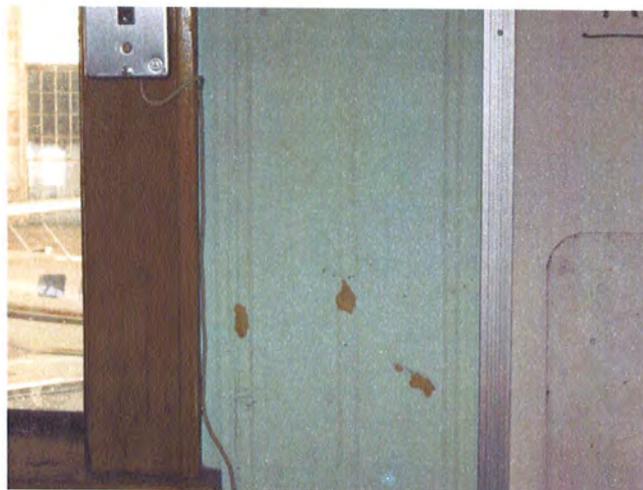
Direction: East. Hangar # 5. Wall board sample 0008 was taken from wall on the foreground.
